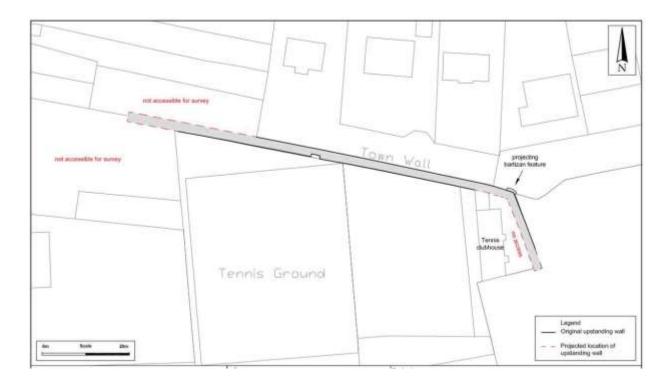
Plan showing extent of up-standing remains of the Town Wall.
